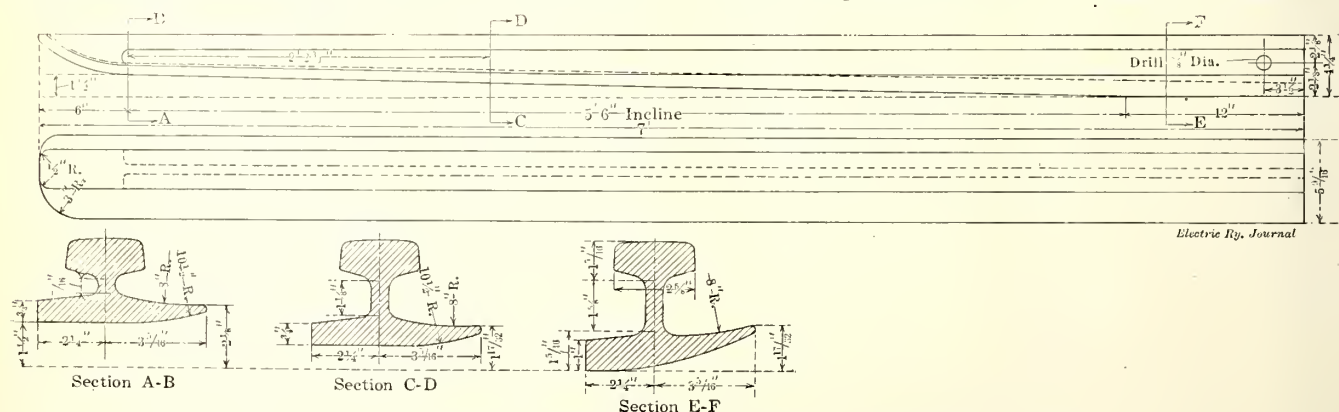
Detroit Tunnel—Plan and Section of Third-Rail Incline
